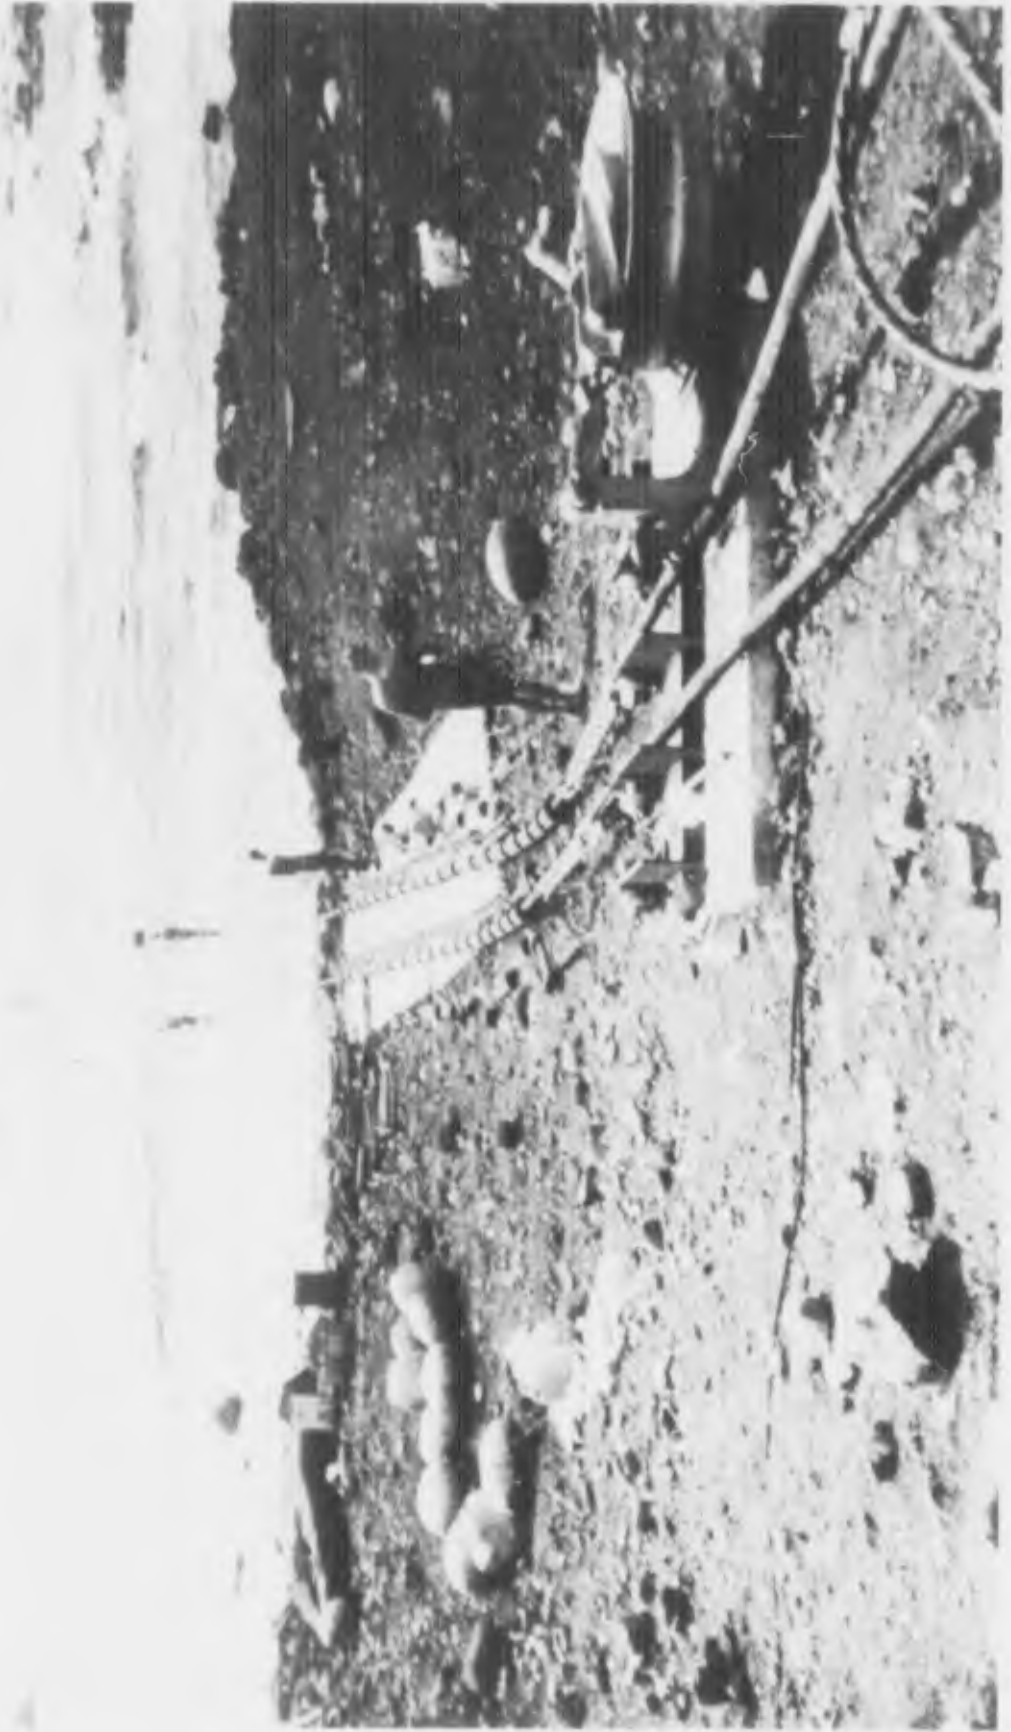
FIGURE XV: IMPROVED TECHNIQUE FOR APPLYING CABLE PROTECTORS
